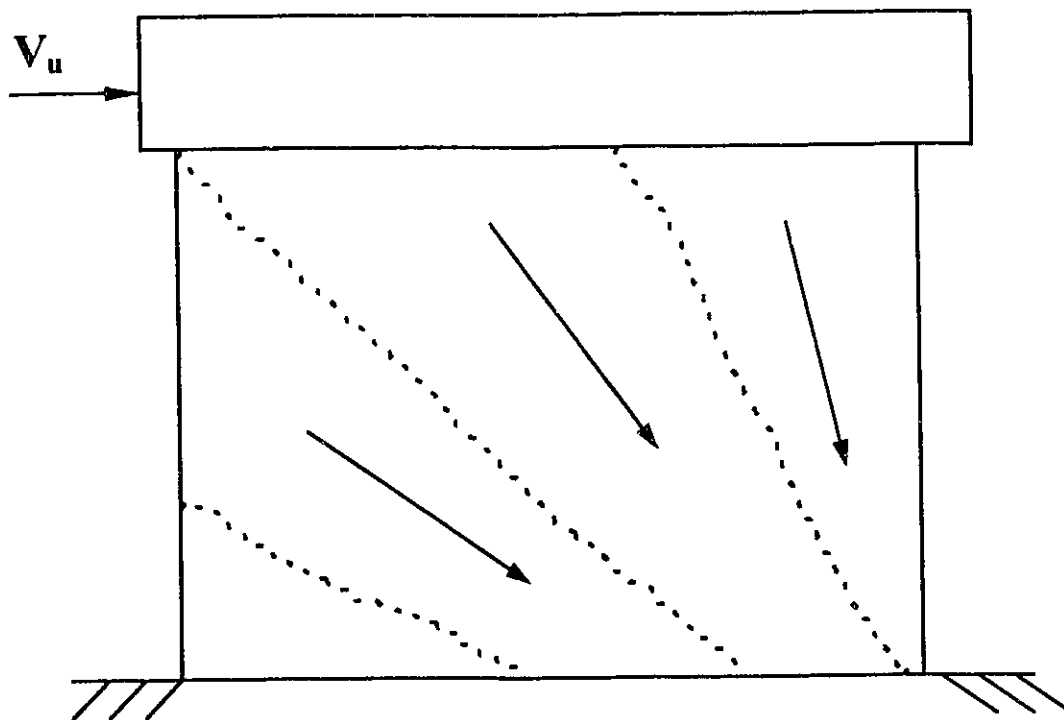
Typical Low-Rise Shear Wall Subjected to Lateral Load
